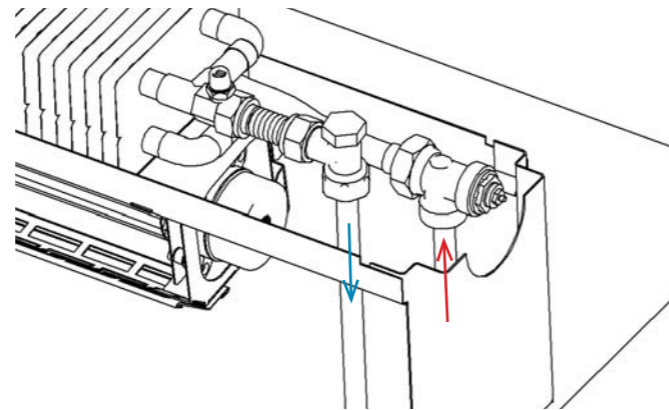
Install the heat exchanger and connect the fittings - see paragraph 6. Test fitting connection tightness.
